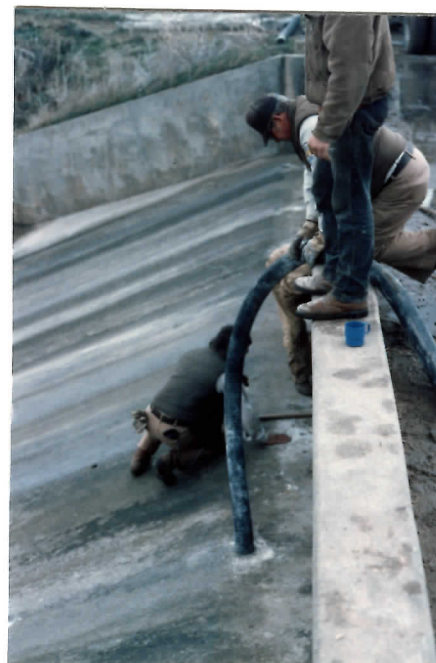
The 9-Bay after the new wall and apron have been added and the void filled. 92-BKM
